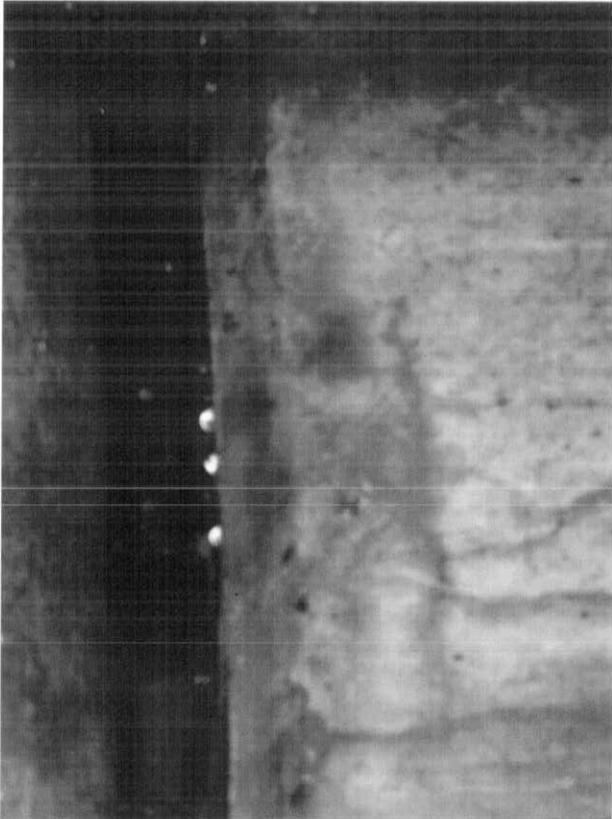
TYPICAL LONGITUDINAL CRACKING IN BOTTOM OF GIRDERS IN SPAN # 1.
